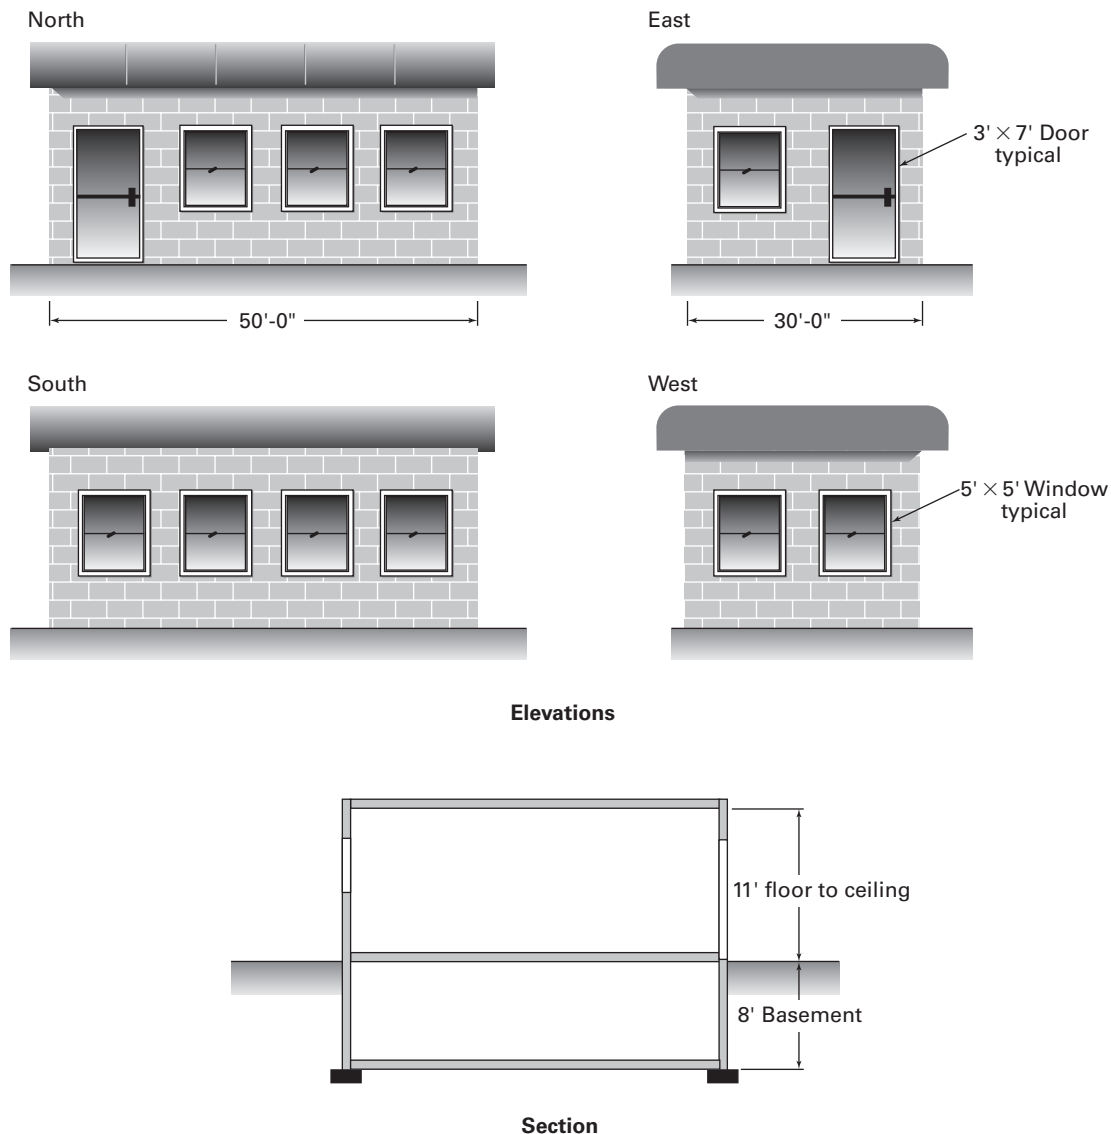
Elevations and section of the building, Problem 3.1. *U*-factors are as follows: walls, 0.064; roof, 0.32; windows, 0.35; and doors, 0.75.
